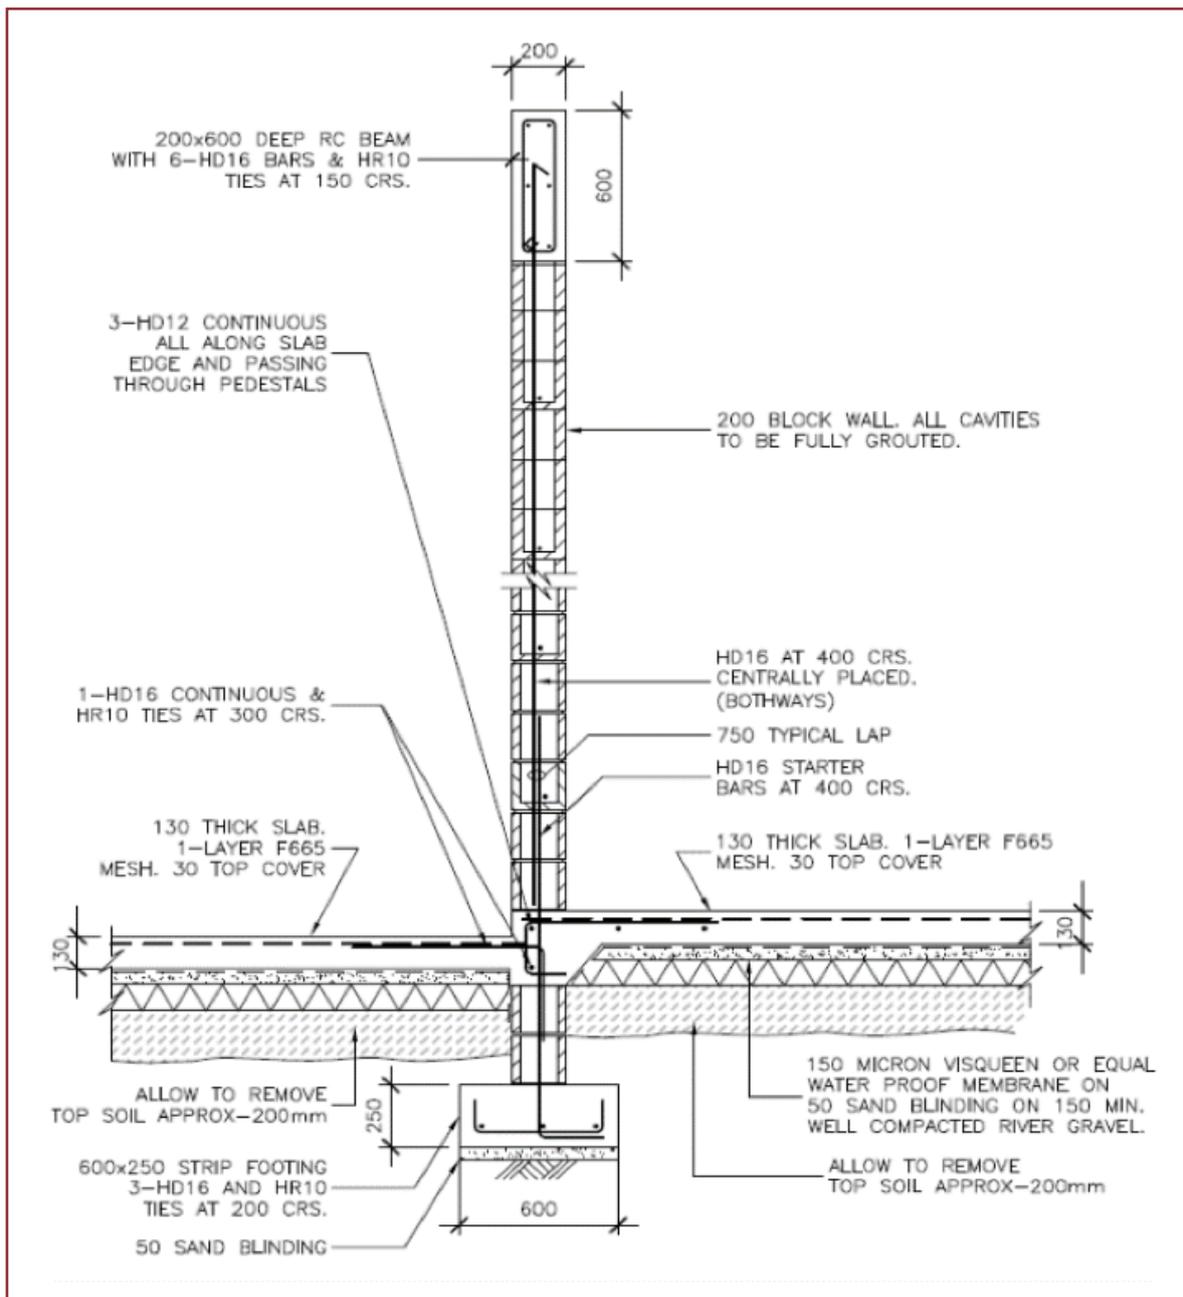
Typical Footing & Wall Detail Section, New Classroom Building, Nailuva District School (Source: Construction Implementation Unit, Ministry of Economy, Fiji)
